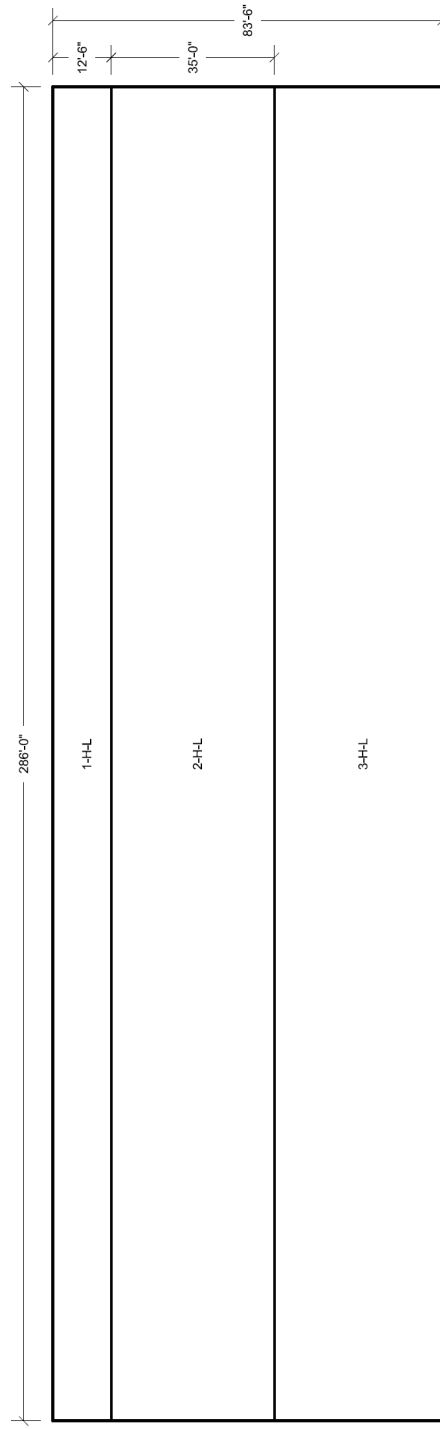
H-6-87: UHS BASIN SOUTH WALL LOOKING NORTH
